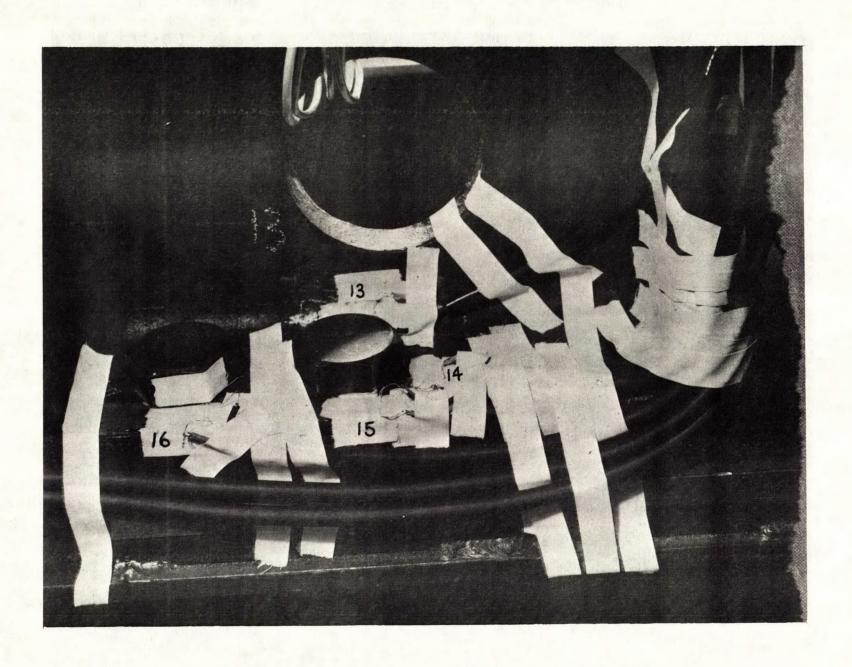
Close-up of Tangential Gauges Near Bolt-Holes
